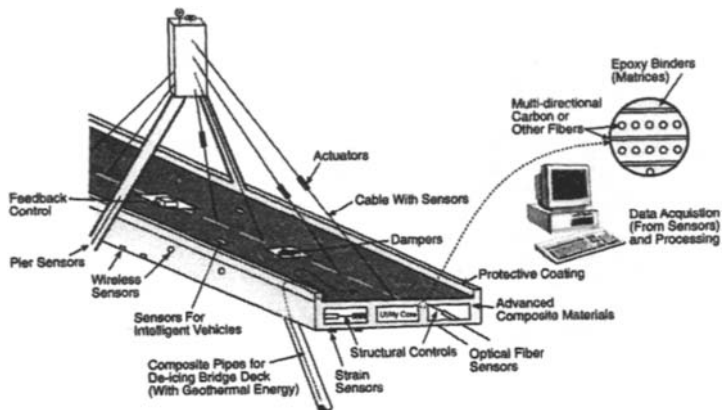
A Futuristic Smart Bridge System with Thin-Walled Advanced Composite Box Girders
